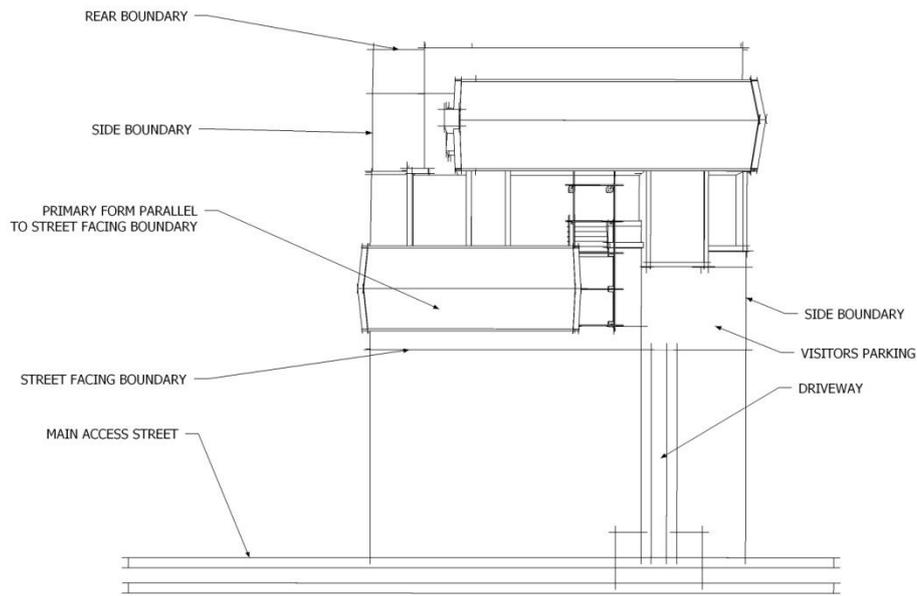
Typical Fynbos & Paddock Site House - Top View
